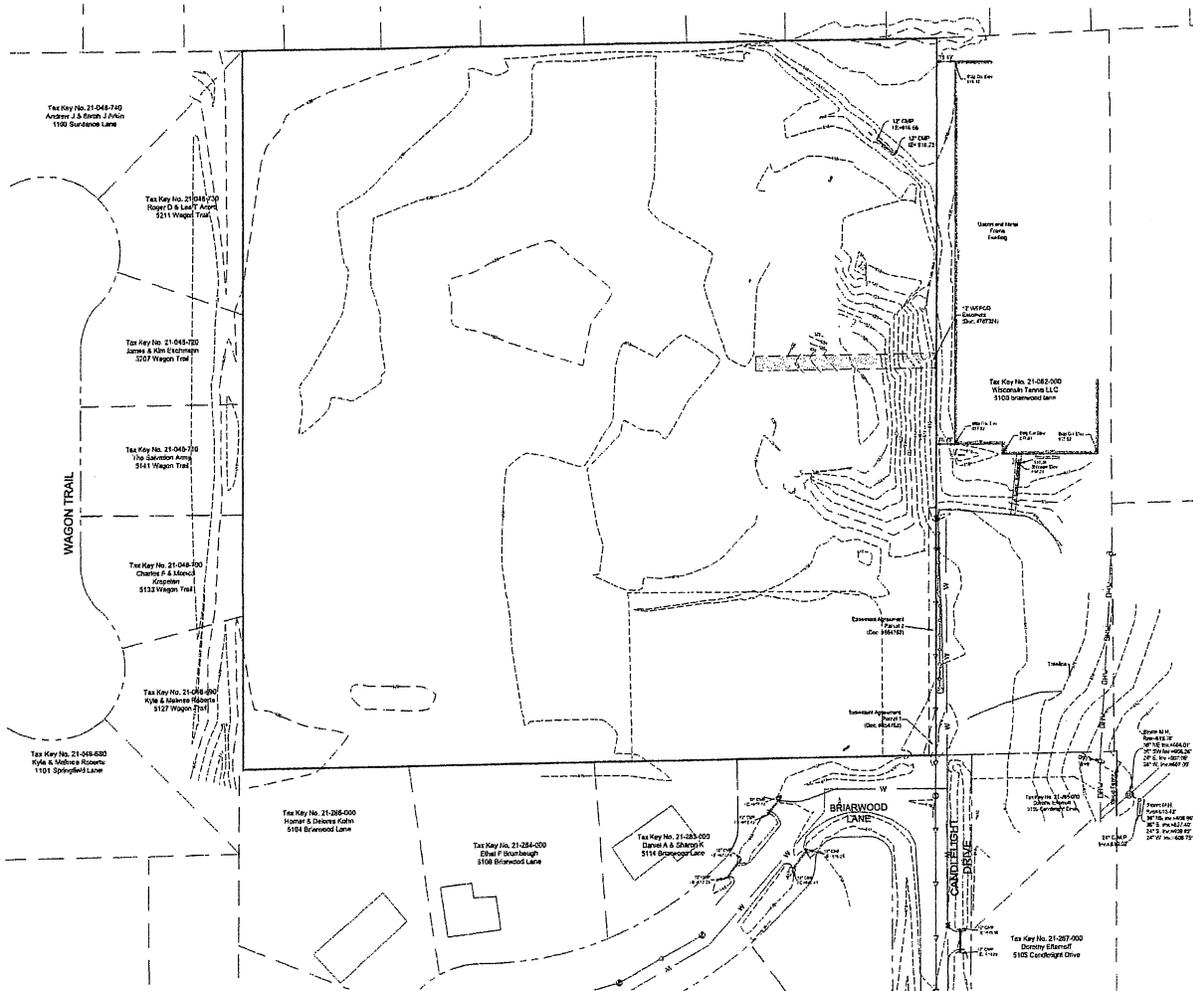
Exhibit B – Wet Pond Overall Drainage & Grading Plan
